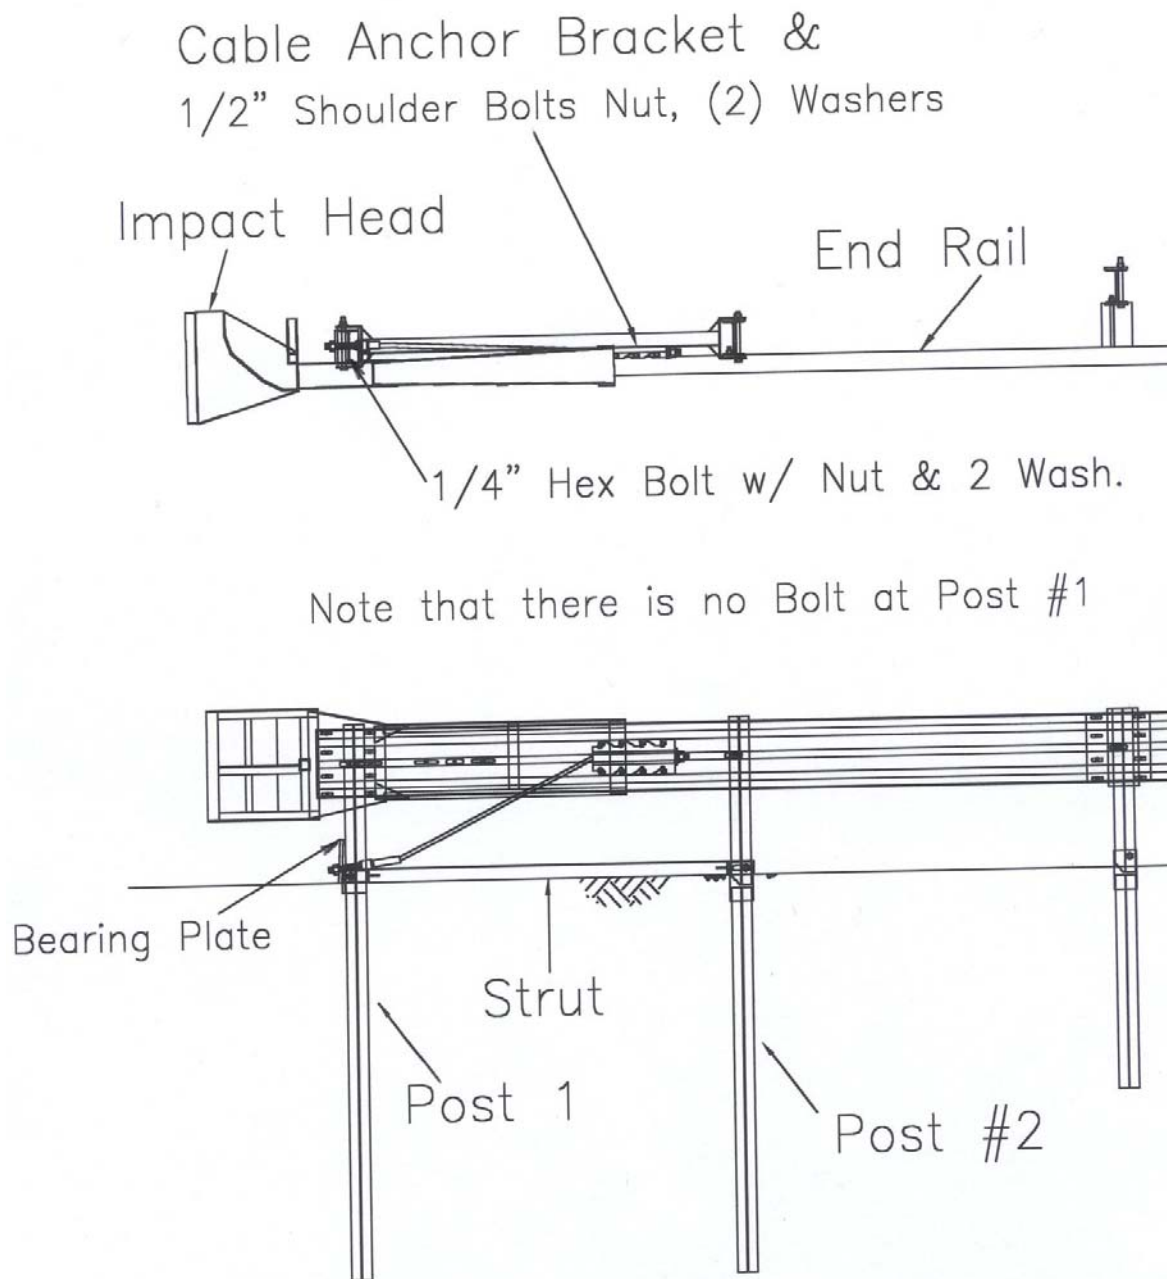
Section Views of Bolted Hinged Steel End Posts and Line Posts
